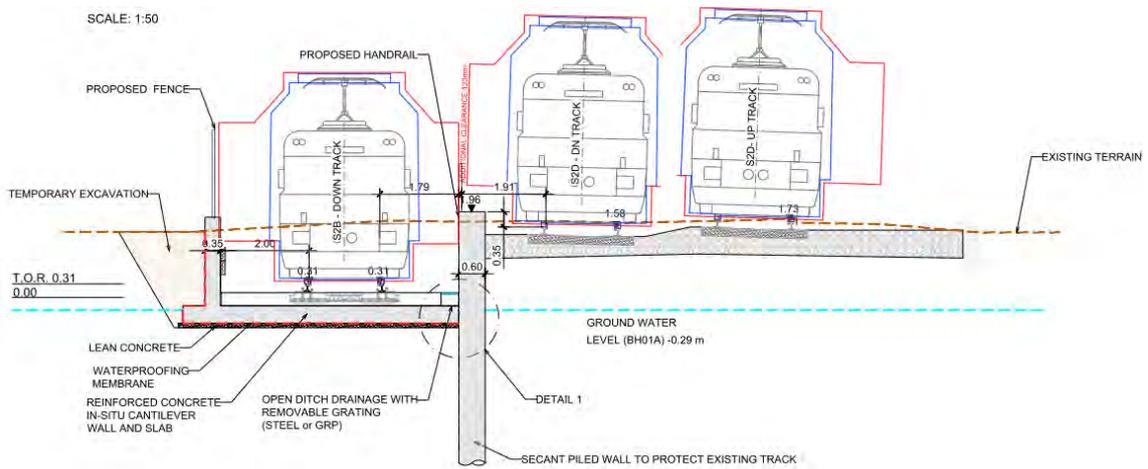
Spencer Dock proposed walls and protection slabs - Structure B
